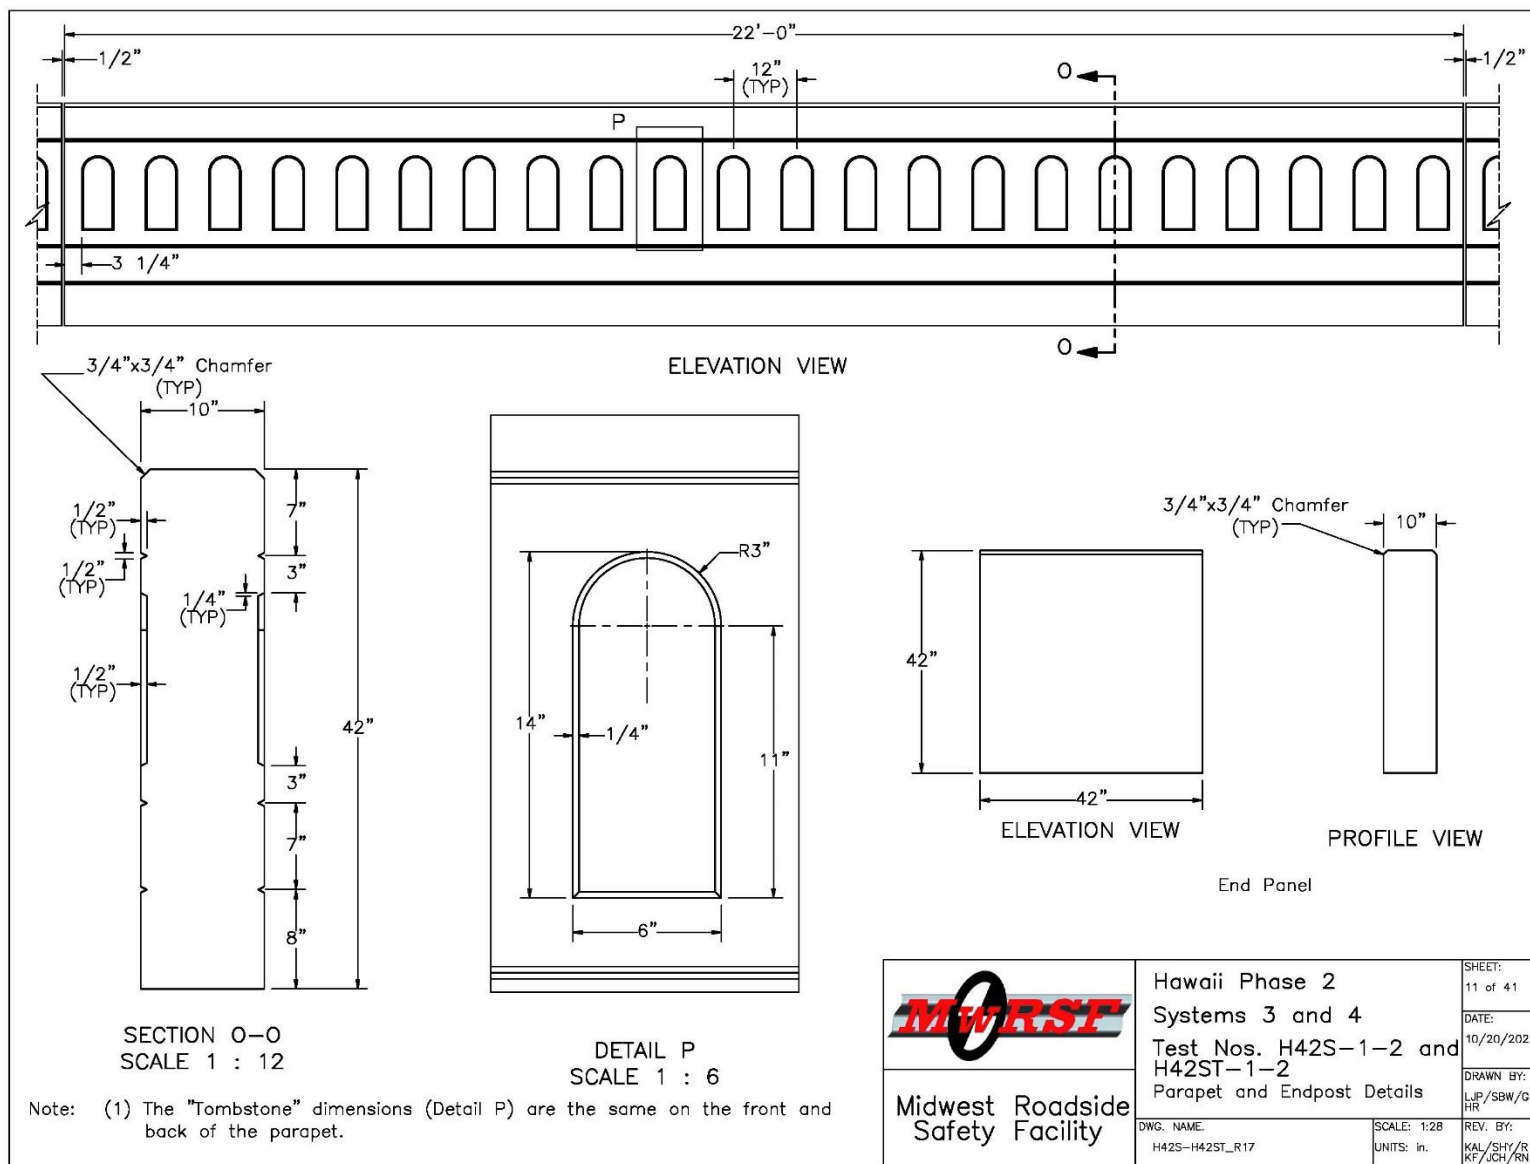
Parapet and Endpost Details, Test Nos. H42S-1 and H42S-2
